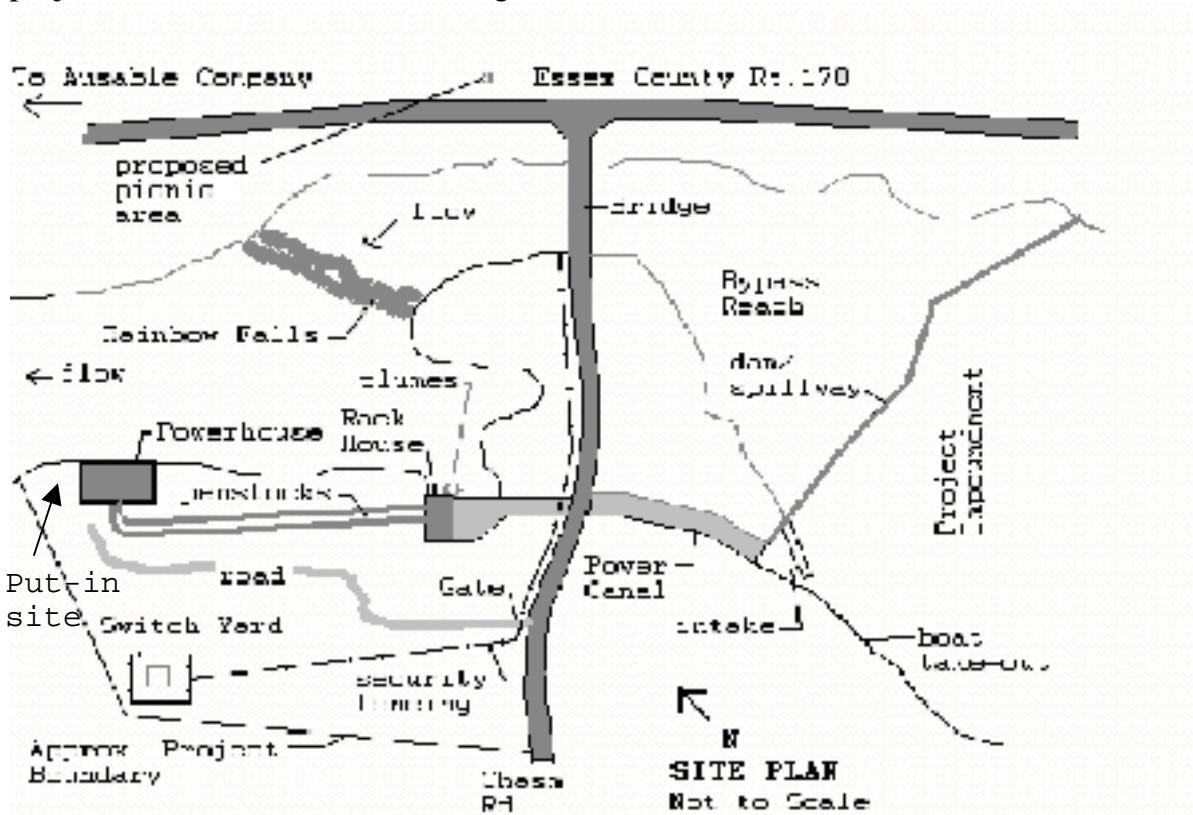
Rainbow Falls Project Site Plan (Source: NYSEG, as modified by staff).
